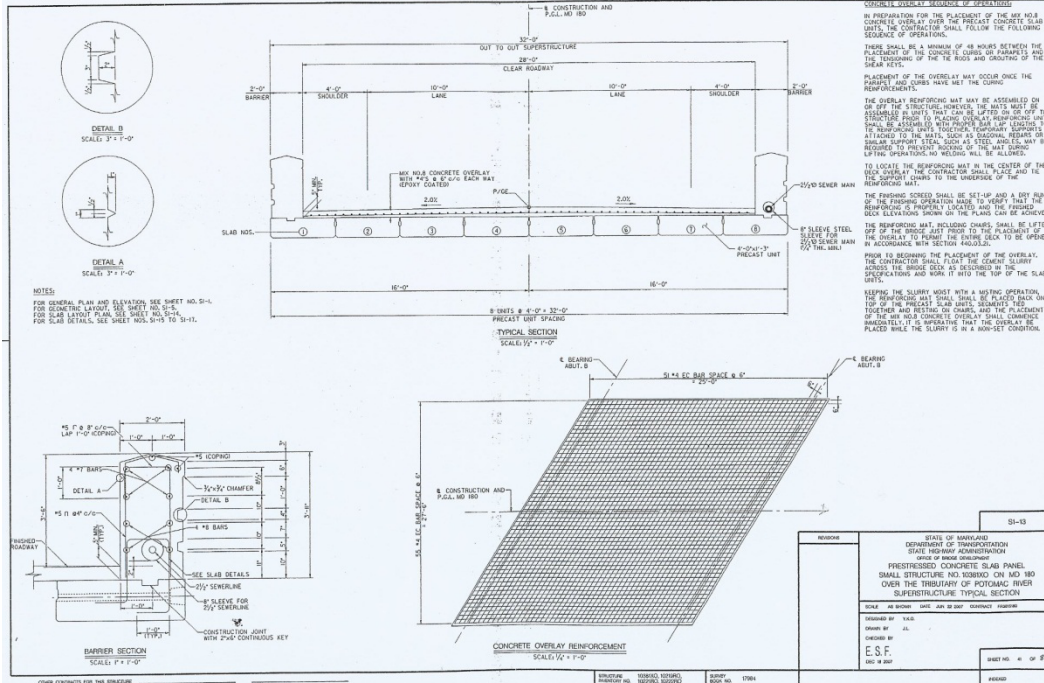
Knoxville, MD, Bridge Superstructure Typical Section
